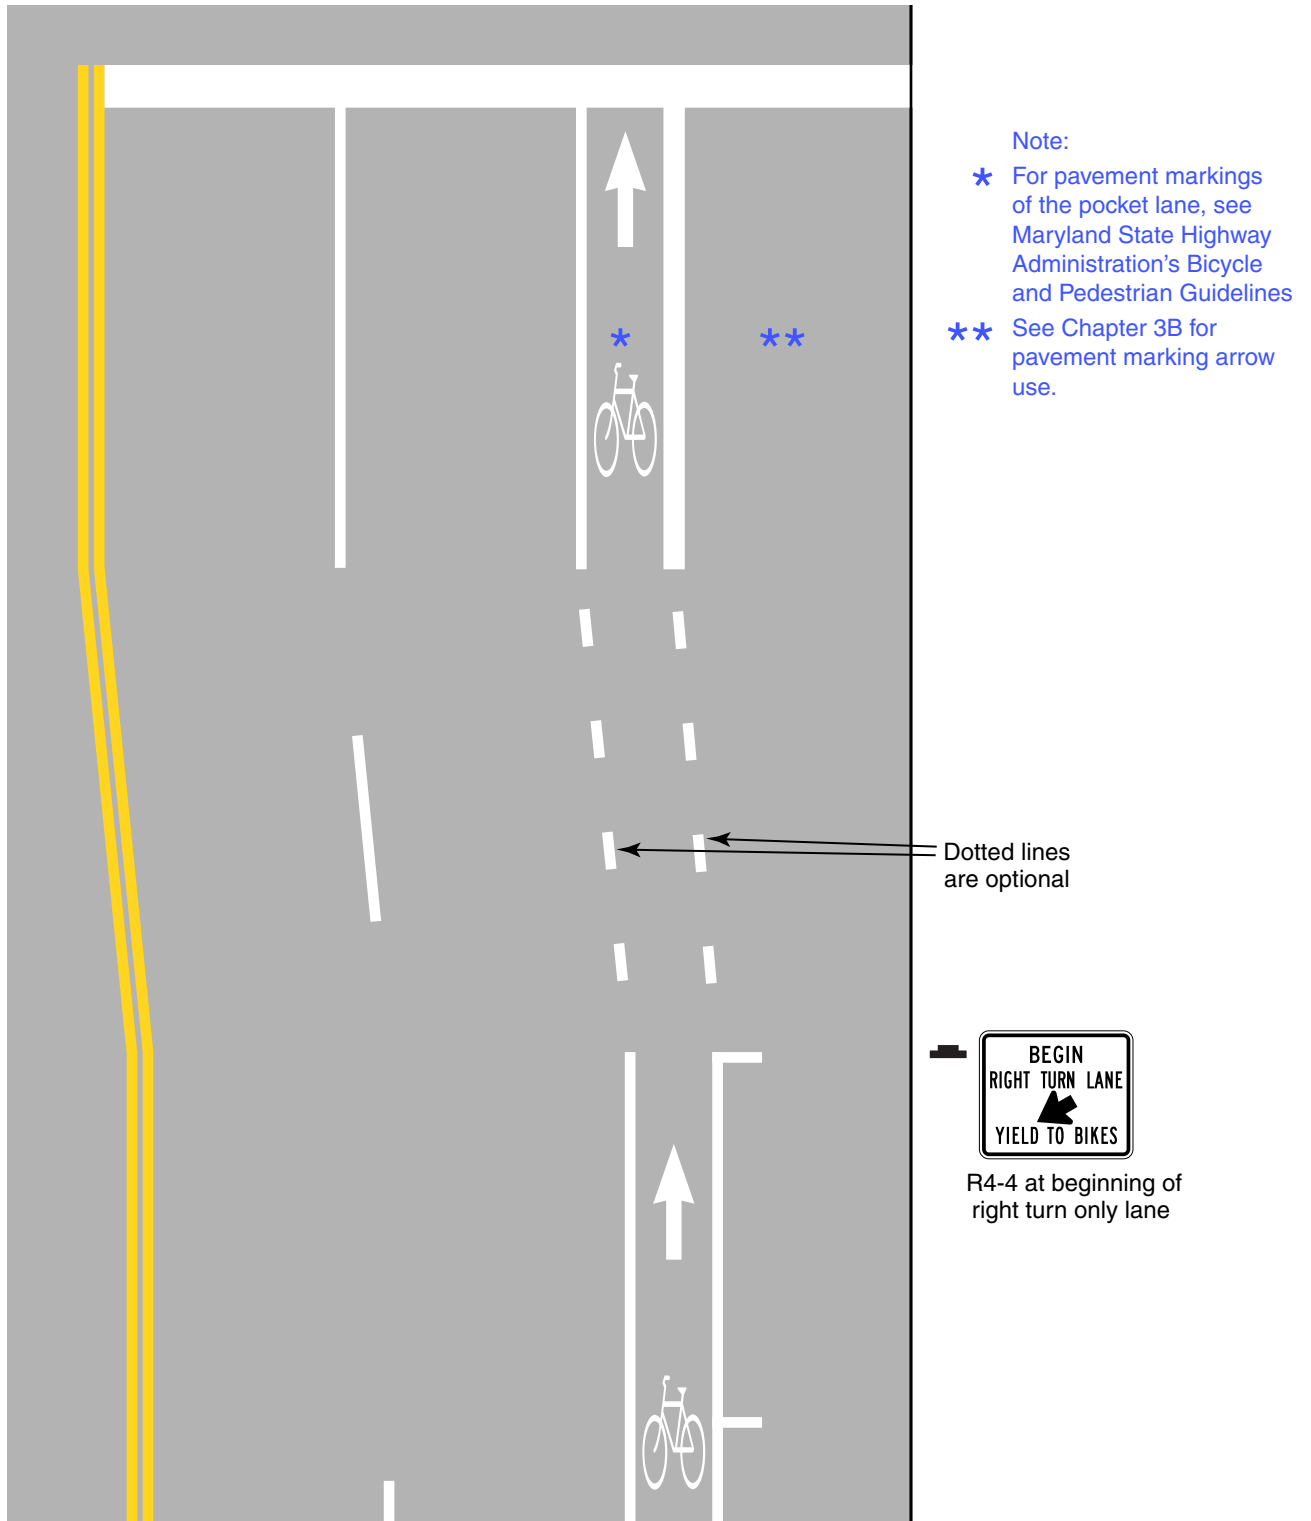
C-2a. Example of Share the Road Pavement Marking SHA
